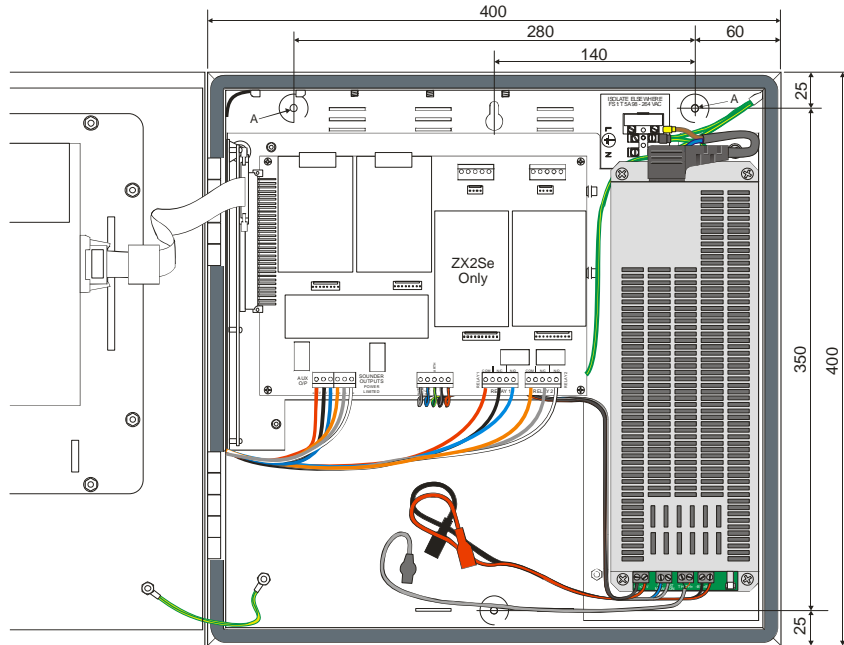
Panel Fixing Centres – ZX1Se / ZX2Se
